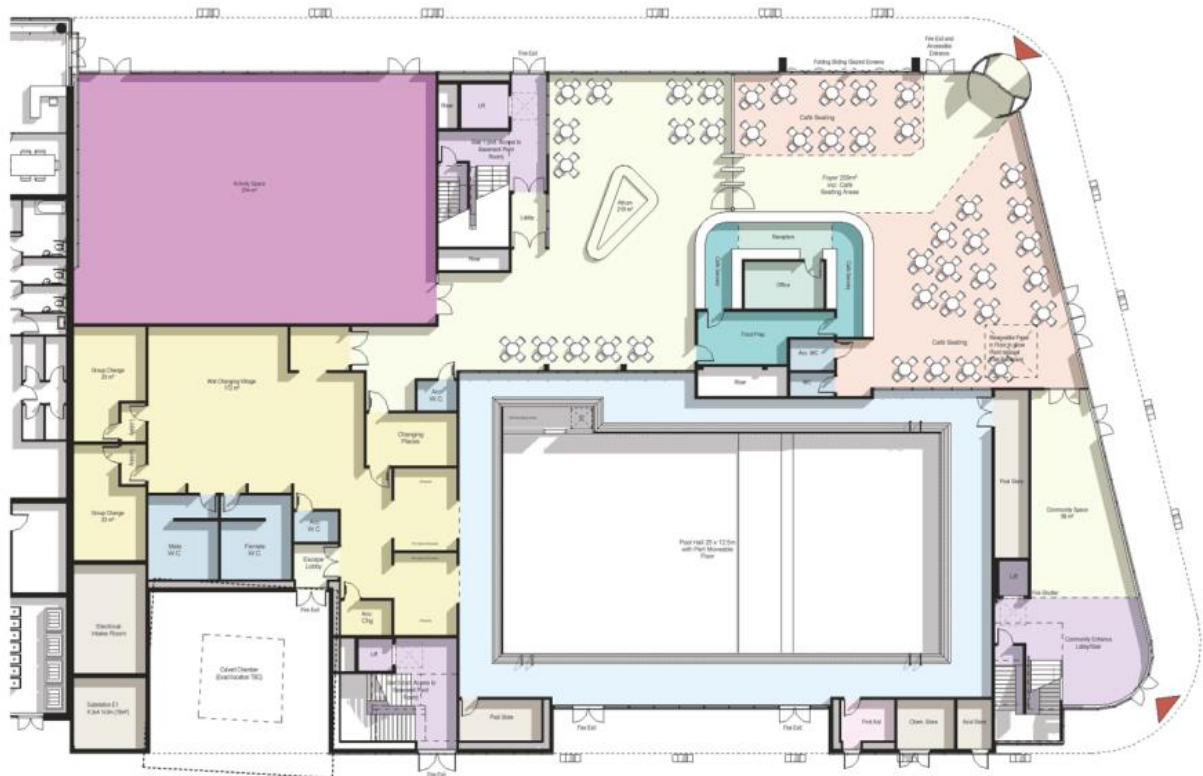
Extract of Proposed Site Layout - Unisys Buildings
